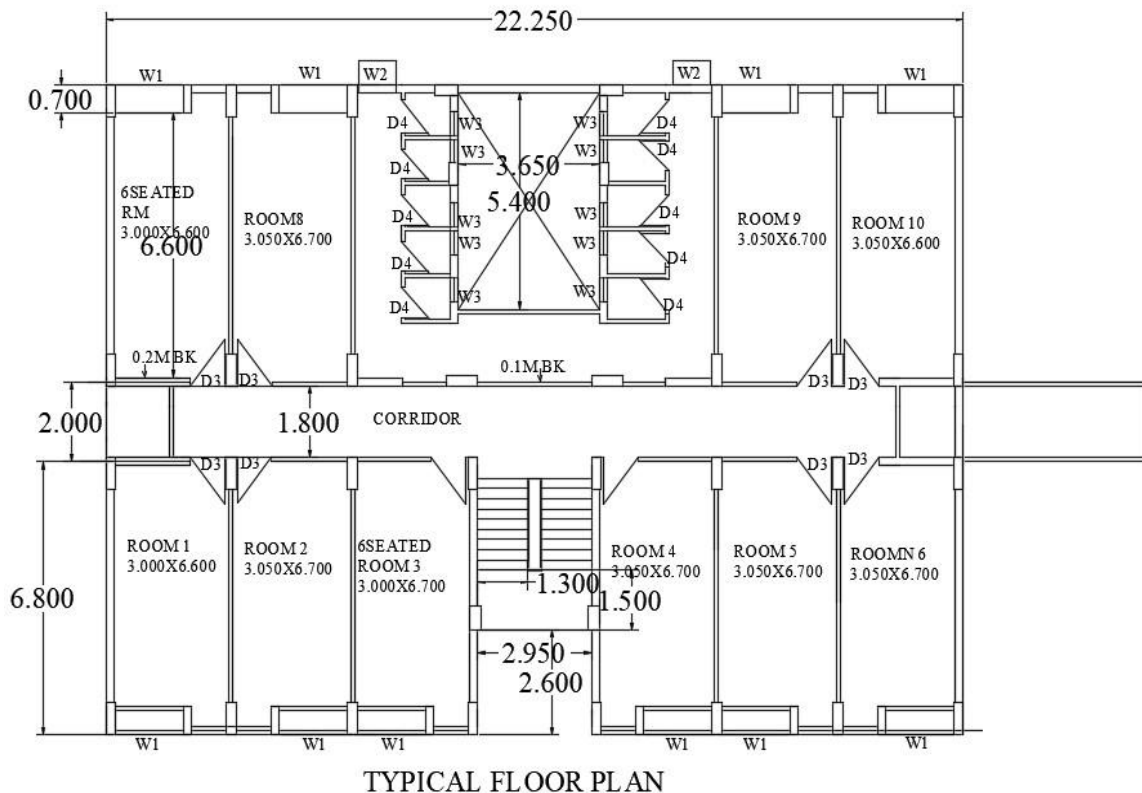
Typical floor plan of the hostel building, Akola, Maharashtra.
